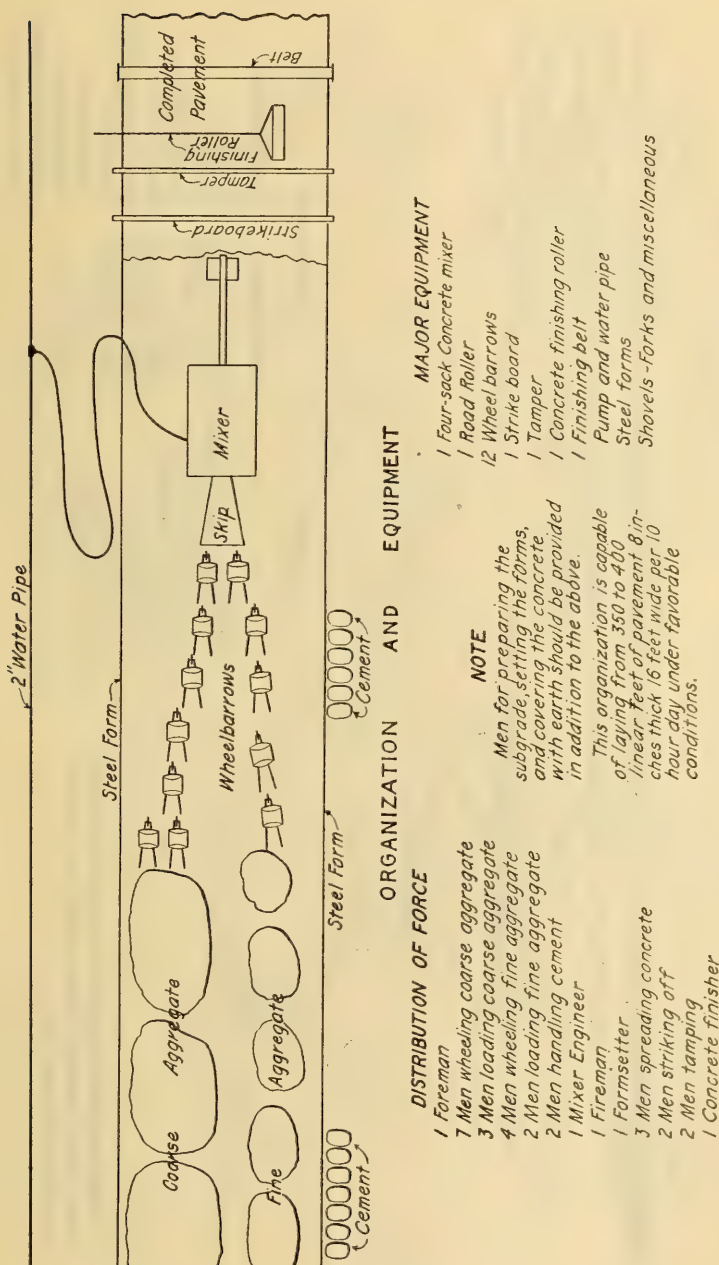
Typical organization and plant layout, wheelbarrow equipment.
